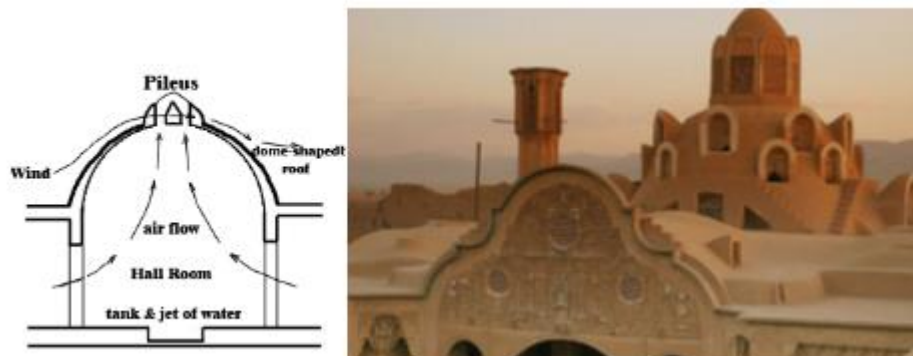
Natural ventilation in Broujerdi House in Kashan (URL 6)
